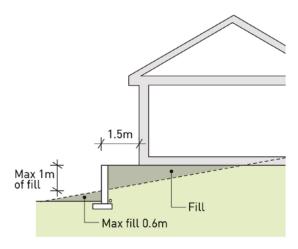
Fill for the purposes of locating a dwelling house on a podium using a retaining wall.
